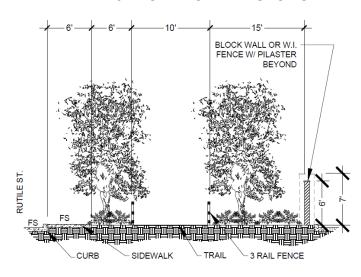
VAN BUREN BLVD. STREET SECTION
